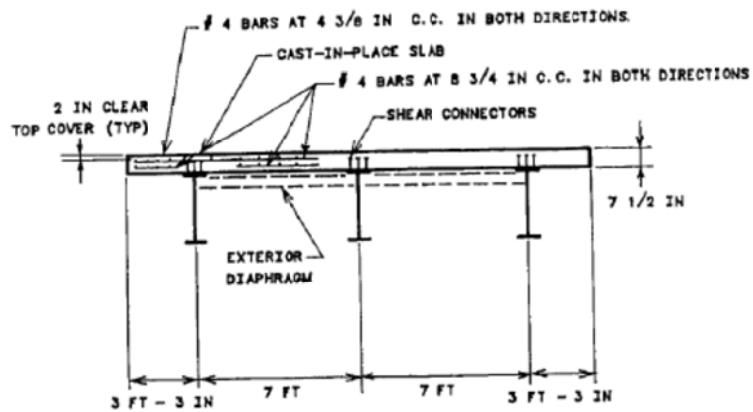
Cross section of test specimen. (Fang et al., 1990)
